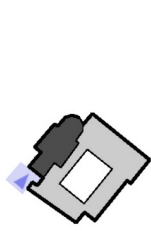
Plan of Deutschenordenkommende in Aachen. Reconstruction made by Werner Ingendaay, 1948. LVR-Amt für Denkmalpflege im Rheinland, historisches Planarchiv.
